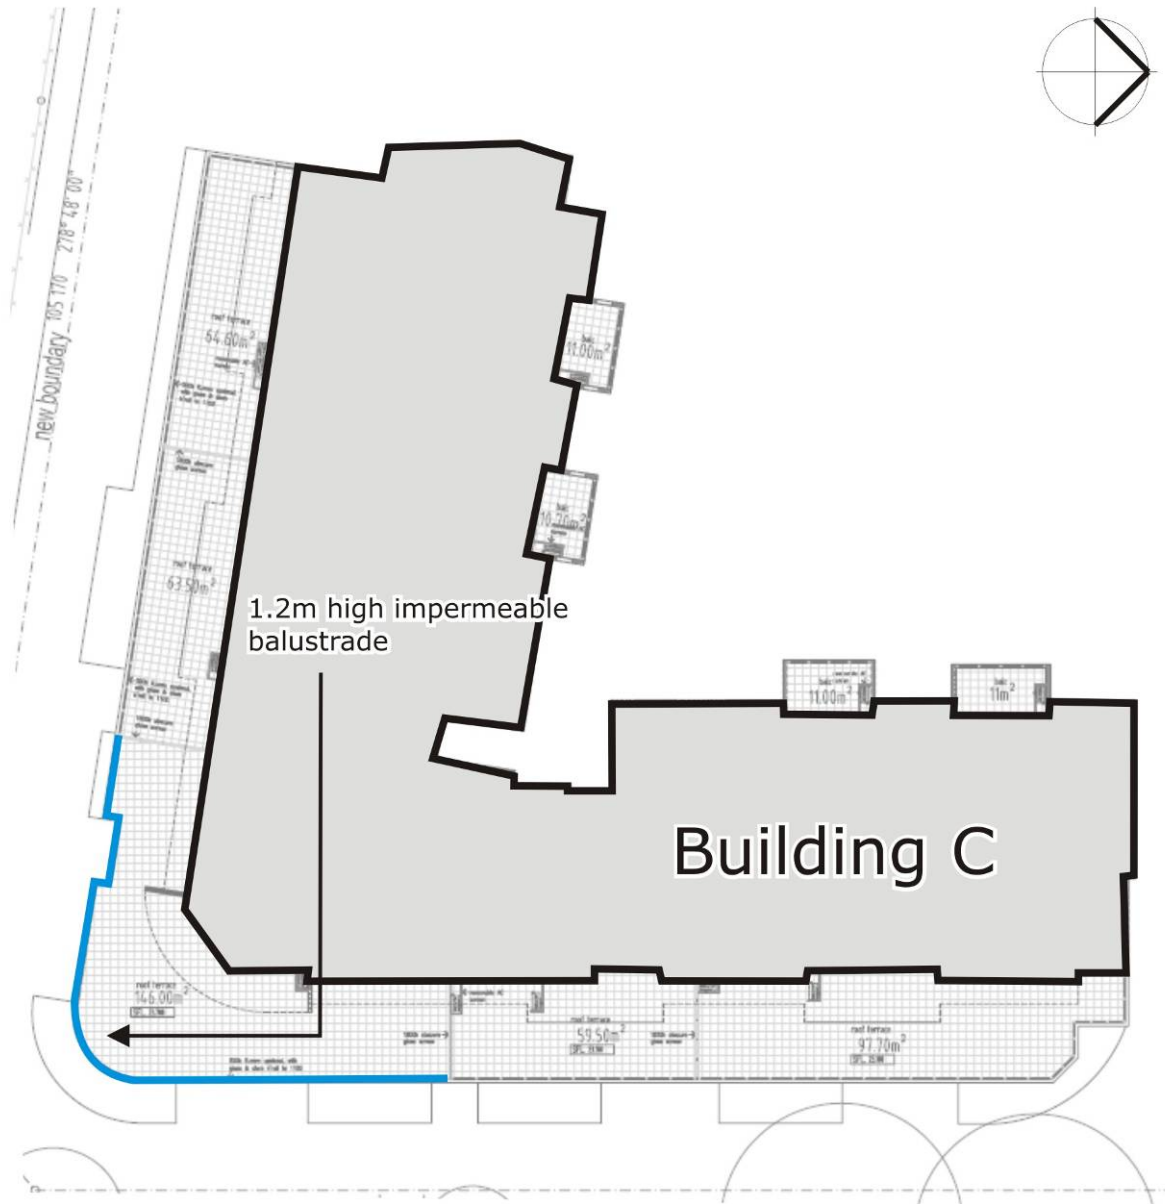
Recommended Treatments for the Level 7 roof terrace on Building C
